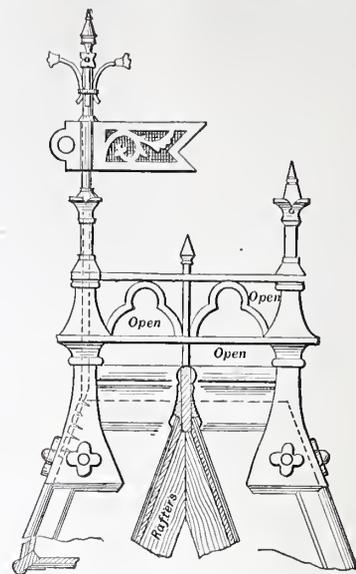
Detail of Tower Finial and Crest.—Scale, 3/8 Inch to the Foot.
